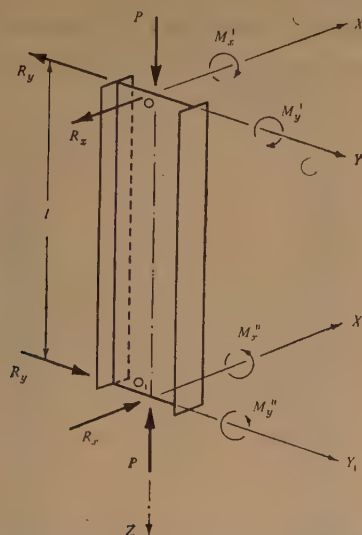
GENERAL LOADING CONDITIONS FOR AN I-SECTION STANCHION LENGTH
